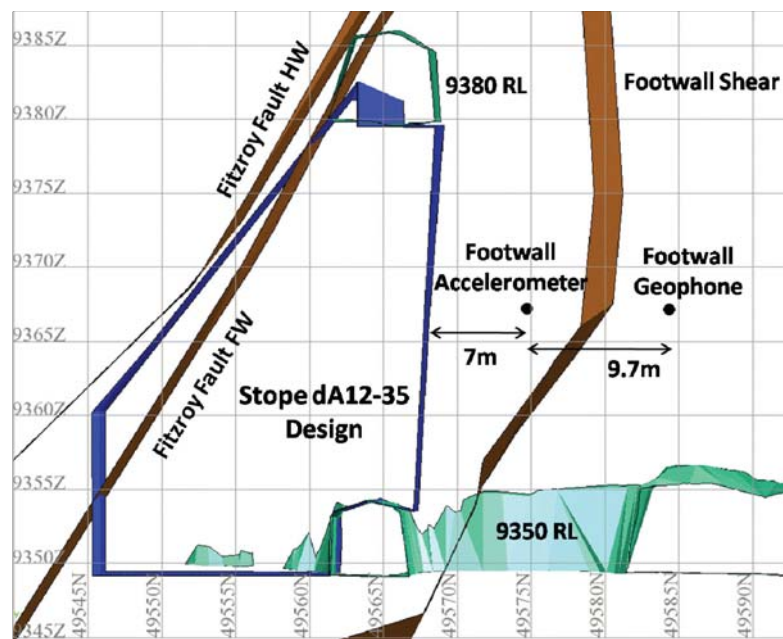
Cross section of stope dA12-35 showing the Fitzroy Fault, footwall shear and the installed footwall transducer locations (looking west).
